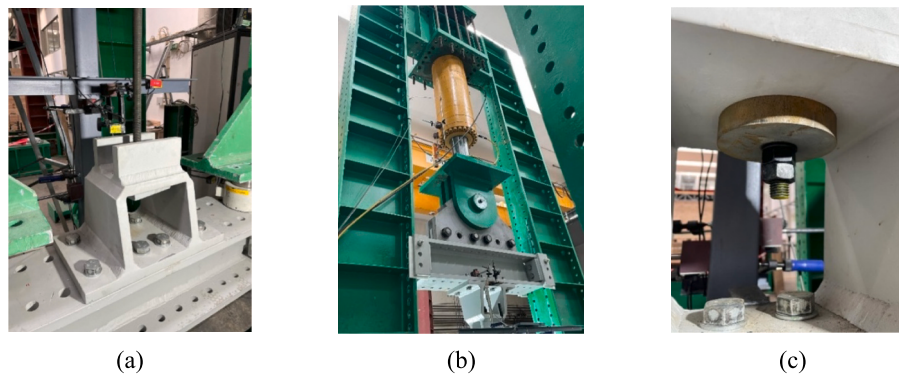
Test layout details: (a) Bolt-to-beam connection tool; (b) Hydraulic jack; (c) Protruding part of the bolt.
